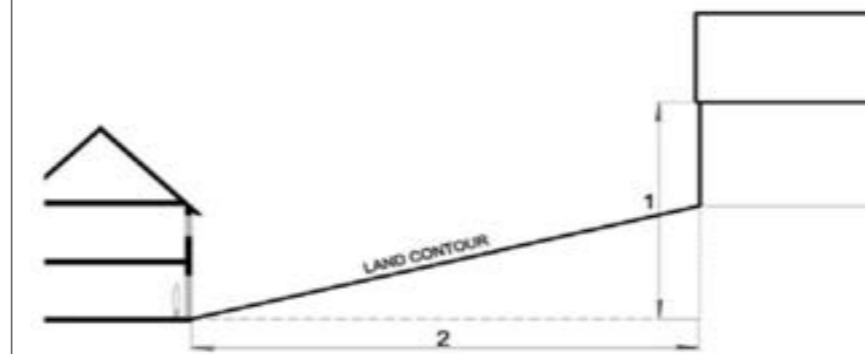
The distance between habitable room windows and an elevated blank wall must be minimum 2 times of the height of the wall plus the level difference.
